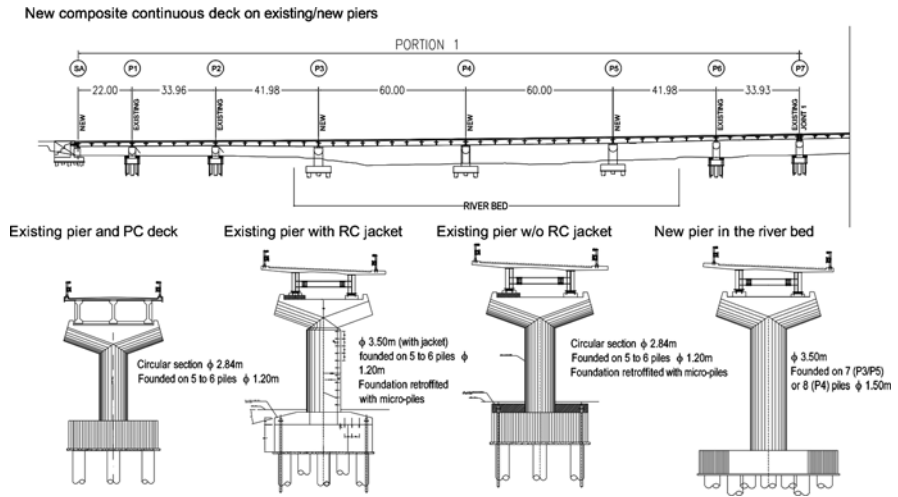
The “Salso” viaduct in South-Western Sicily: longitudinal profile of the upgraded viaduct, analyzed portion (*top*); existing pier and simply supported prestressed concrete deck, retrofitted and new piers with the new continuous steel-concrete deck (*bottom*)
